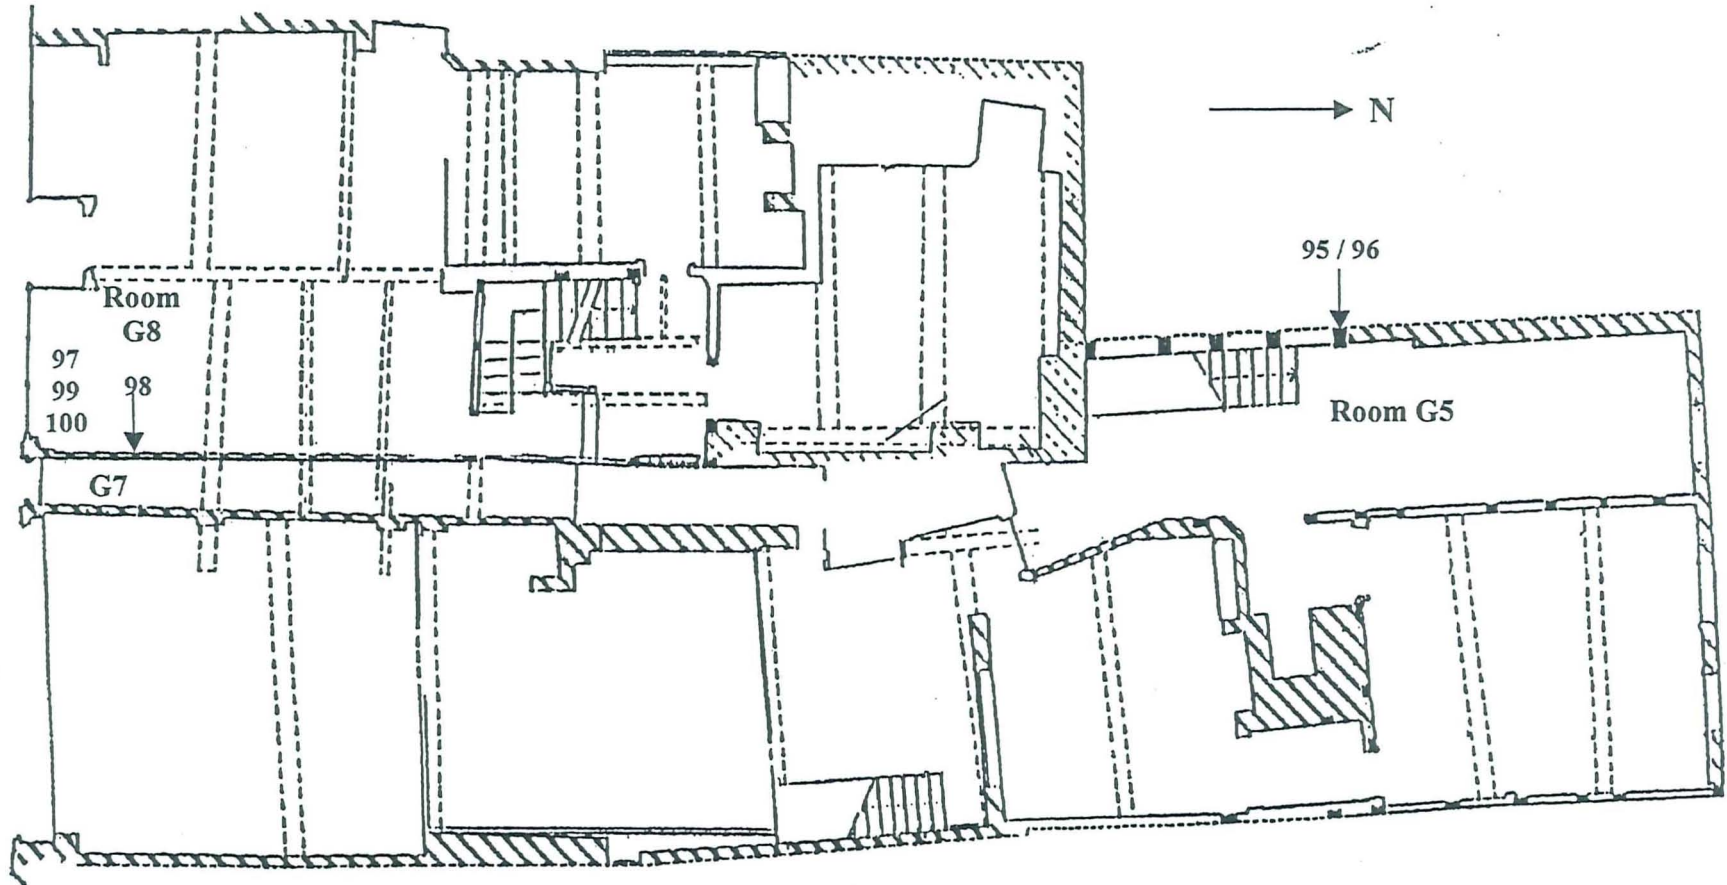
Drawing to show approximate location of sampled timbers from the first floor
